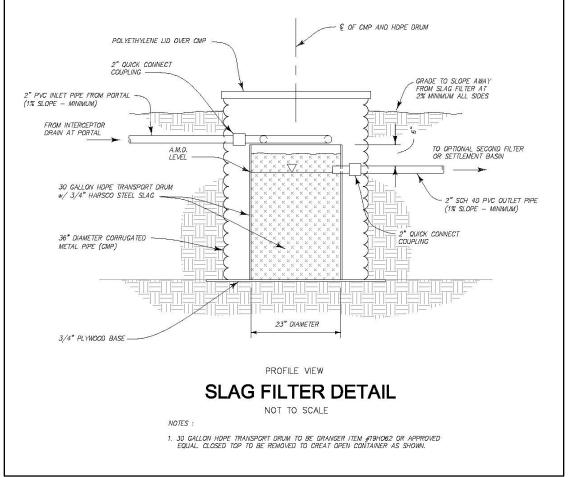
Schematic detail of proposed slag filter. Additional details are provided in Appendix F.
